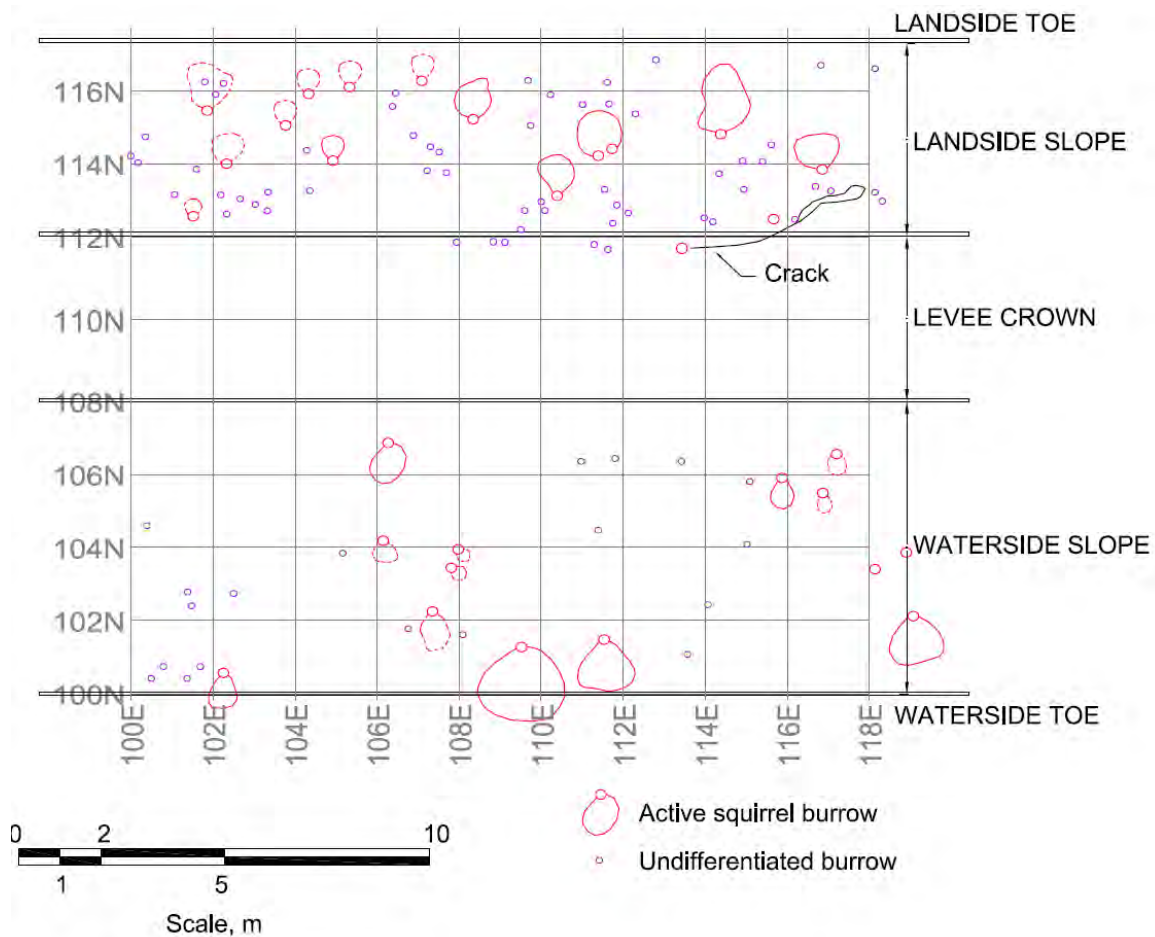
Plan view of surveyed burrows at the sandy levee site
